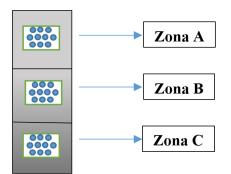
The zones for shooting at column surface for Rebound Hammer Test
